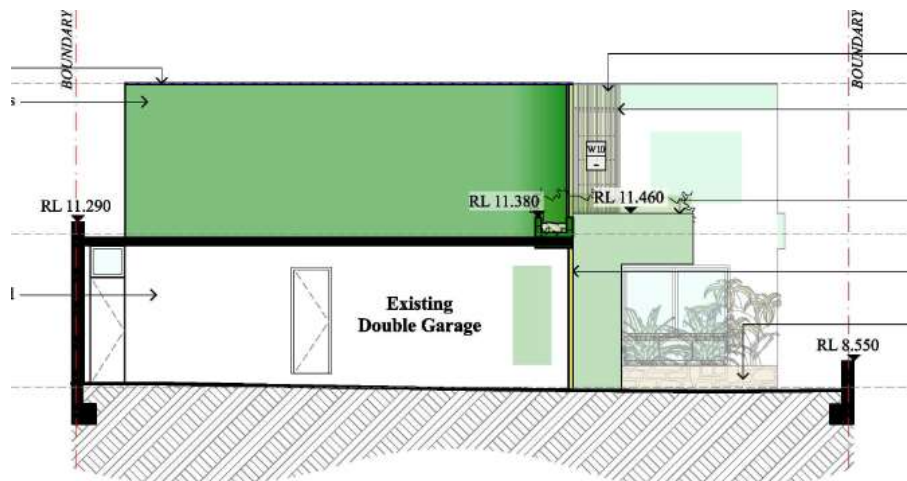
Eastern Elevation (Source: Amended Architectural Plans, Graphio Am, Dated 20 January 2025)
